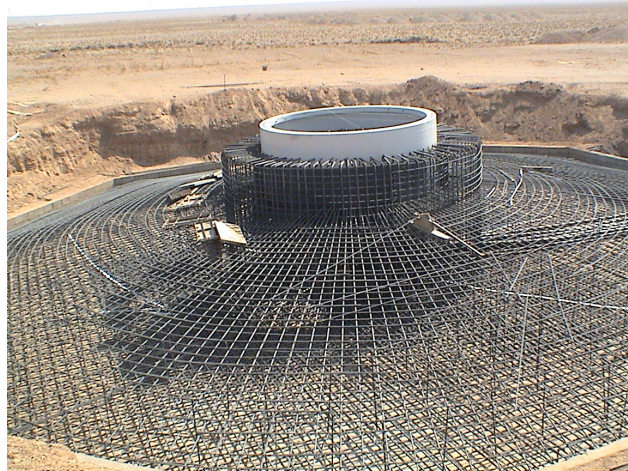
A typical reinforcement arrangement for a gravity foundation
